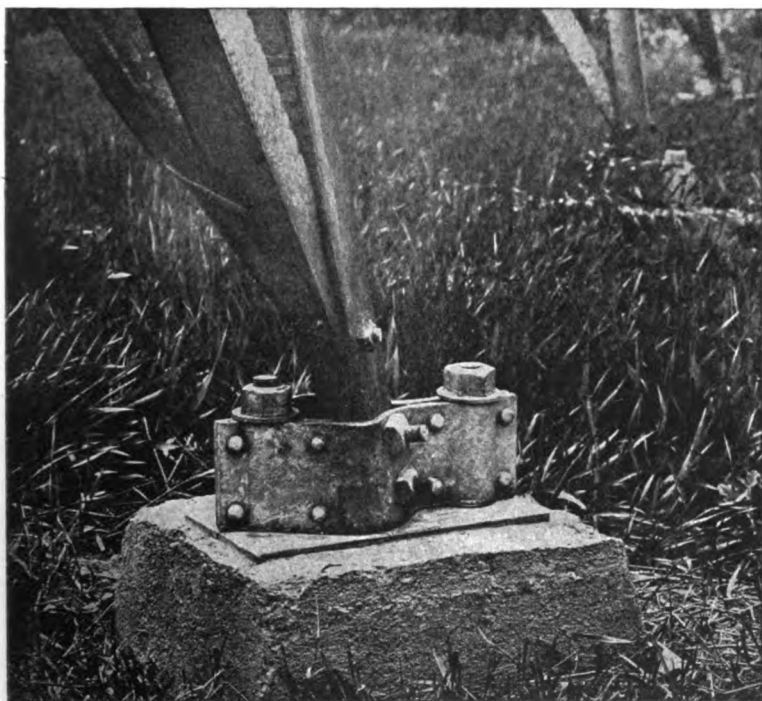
Foot of tower, showing method of fastening tower to foundation
